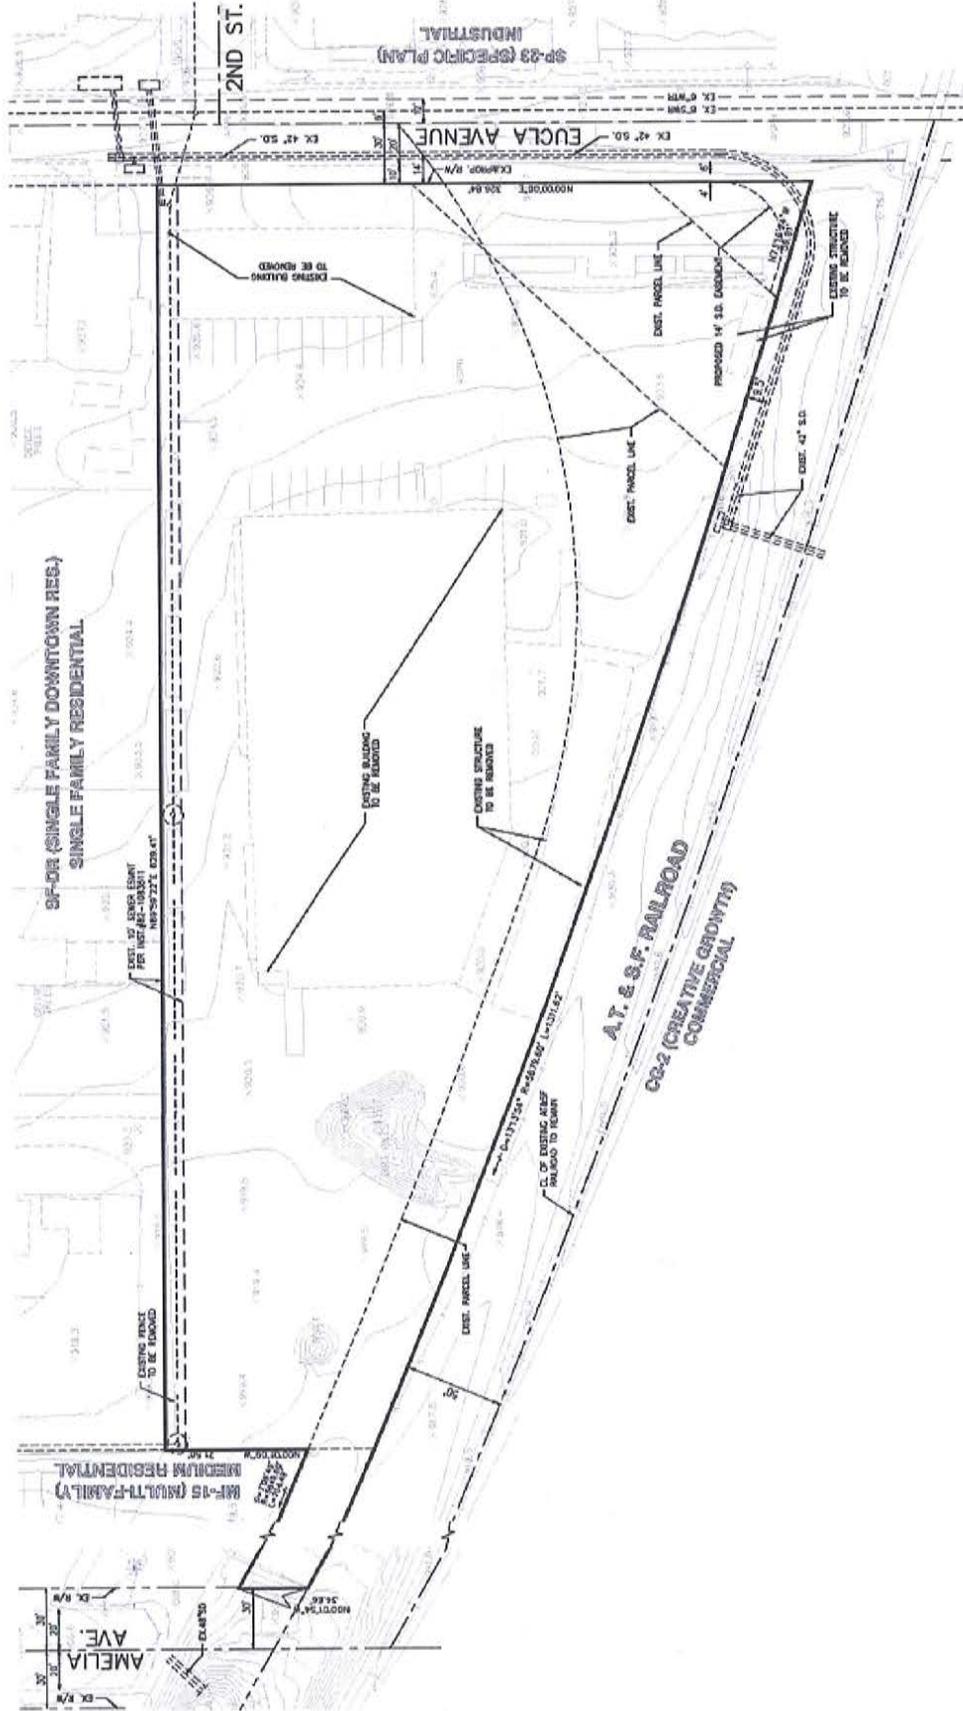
Primary Grading and Storm Drainage Plan for Planning Area III
